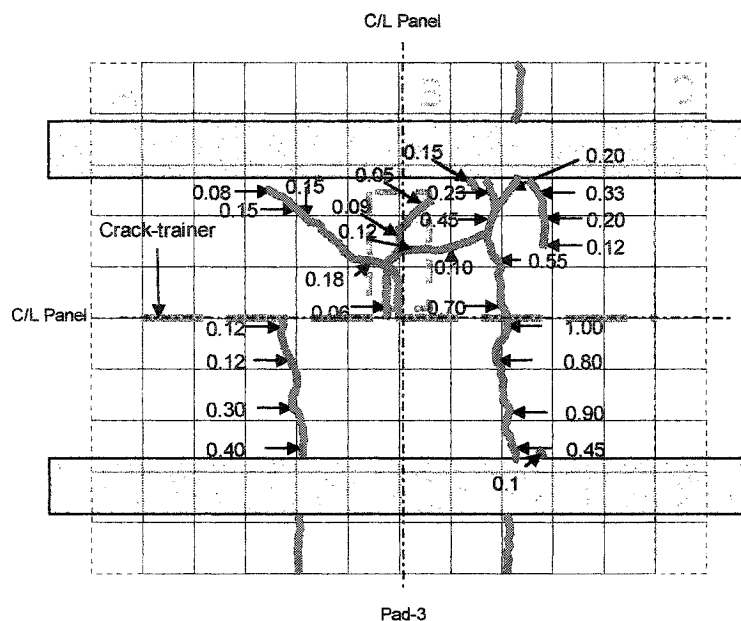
Panel-B: Crack Patterns on Soffit after 1,700 Load Cycles
